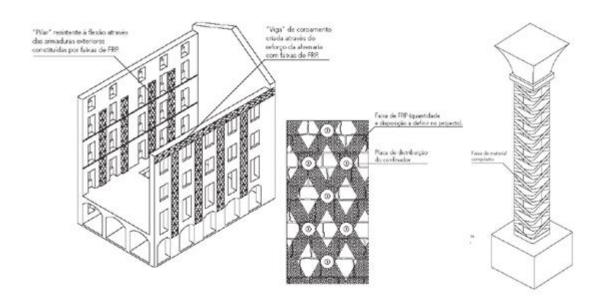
Application of CFRP/GFRP on a building, wall and column
